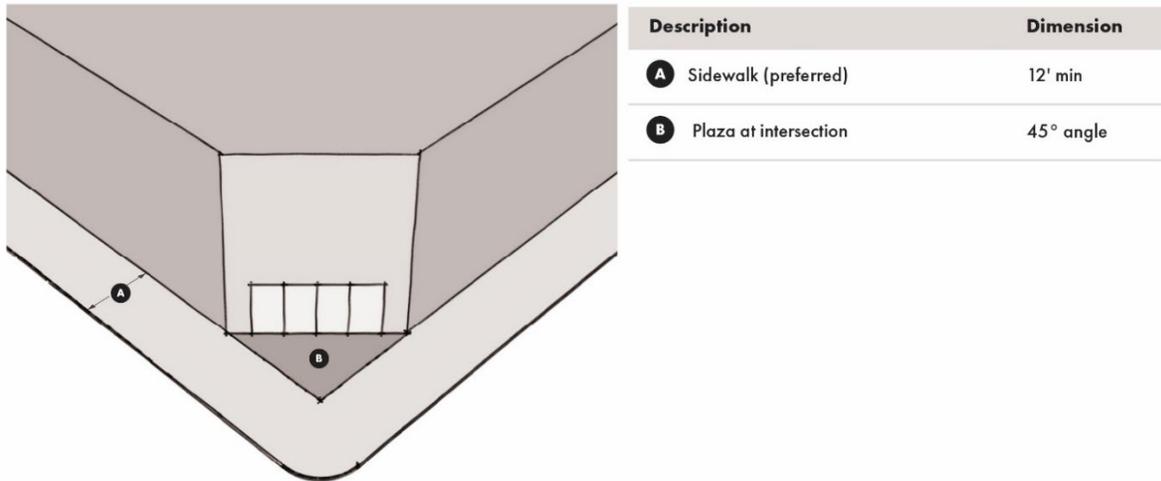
JJ: Corner Plaza at the intersection.
